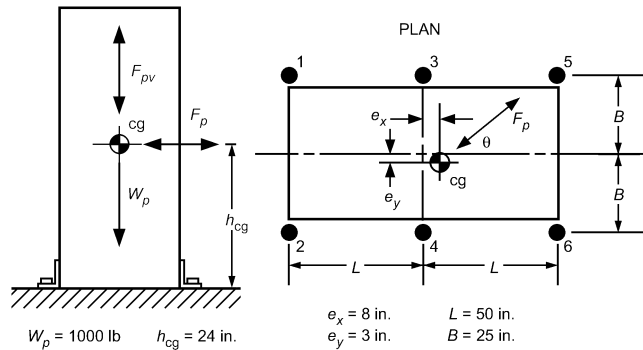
Floor-Mounted Equipment with Solid or Isolated Connection to Structure (Example 5)
